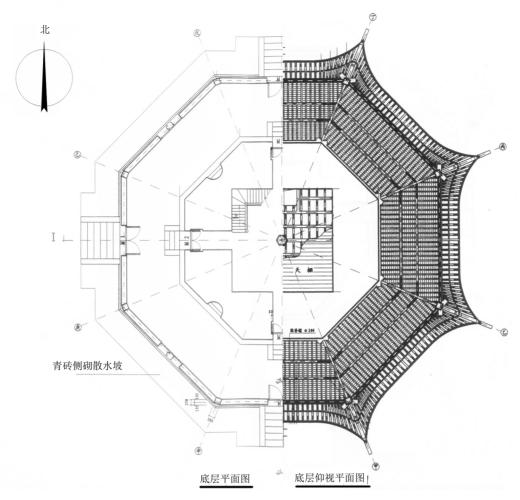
Floor plan of the Wenfeng Pagoda 图 1. 文峰塔平面图
